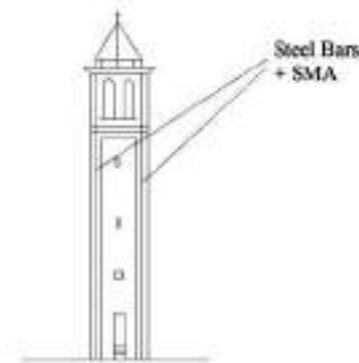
San Giorgio bell tower retrofit using four pretensioned steel tie bars and superelastic SMA devices in the inside corners of the San Giorgio bell tower, anchored to the foundation and the roof (from Indirli *et al.* [2001])
